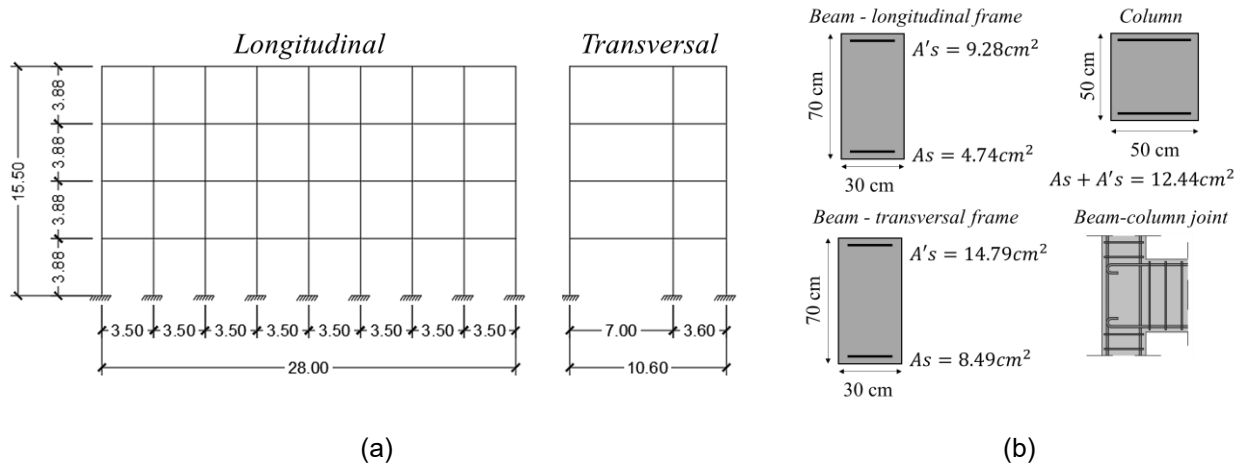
Assumed building geometry: (a) longitudinal and transversal frames; (b) geometrical details of RC members.
